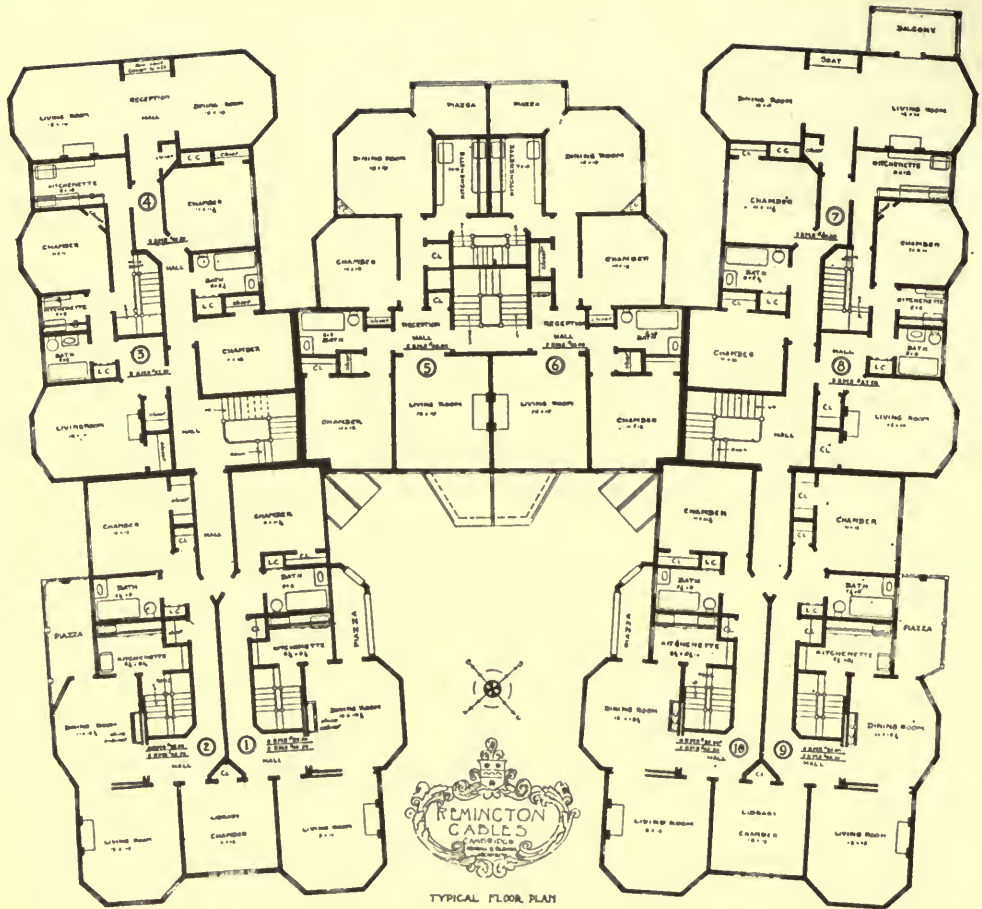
TYPICAL FLOOR PLAN, REMINGTON GABLES, CAMBRIDGE, MASS.
